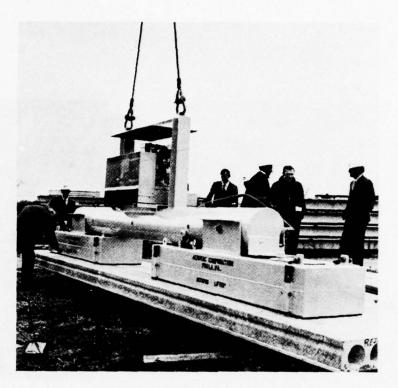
Vacuum lifter (courtesy of American Concrete Institute⁵⁹)
